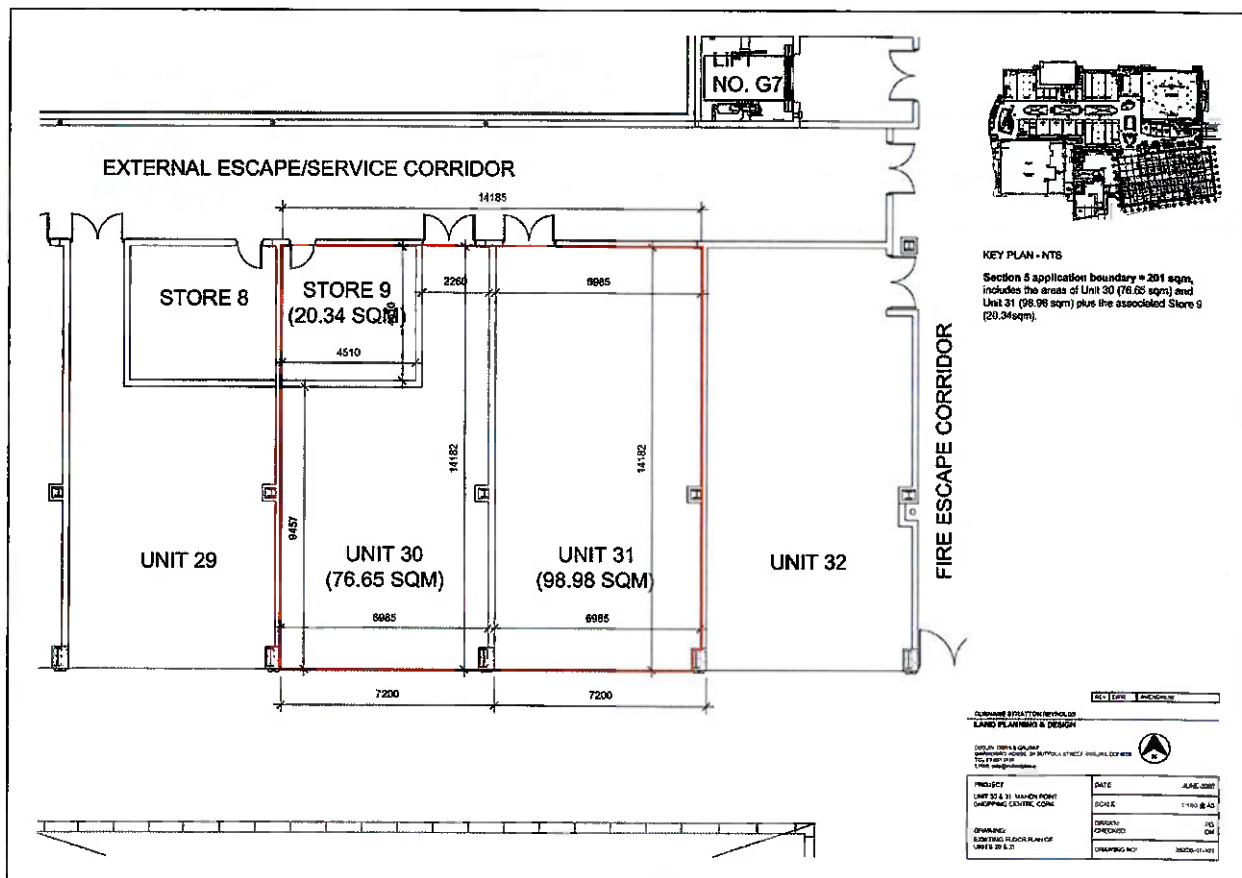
Extract from CSR Drawing No. 26226-01-101 – Existing Floor Plan, Units 30 and 31, Mahon Point Shopping Centre.
